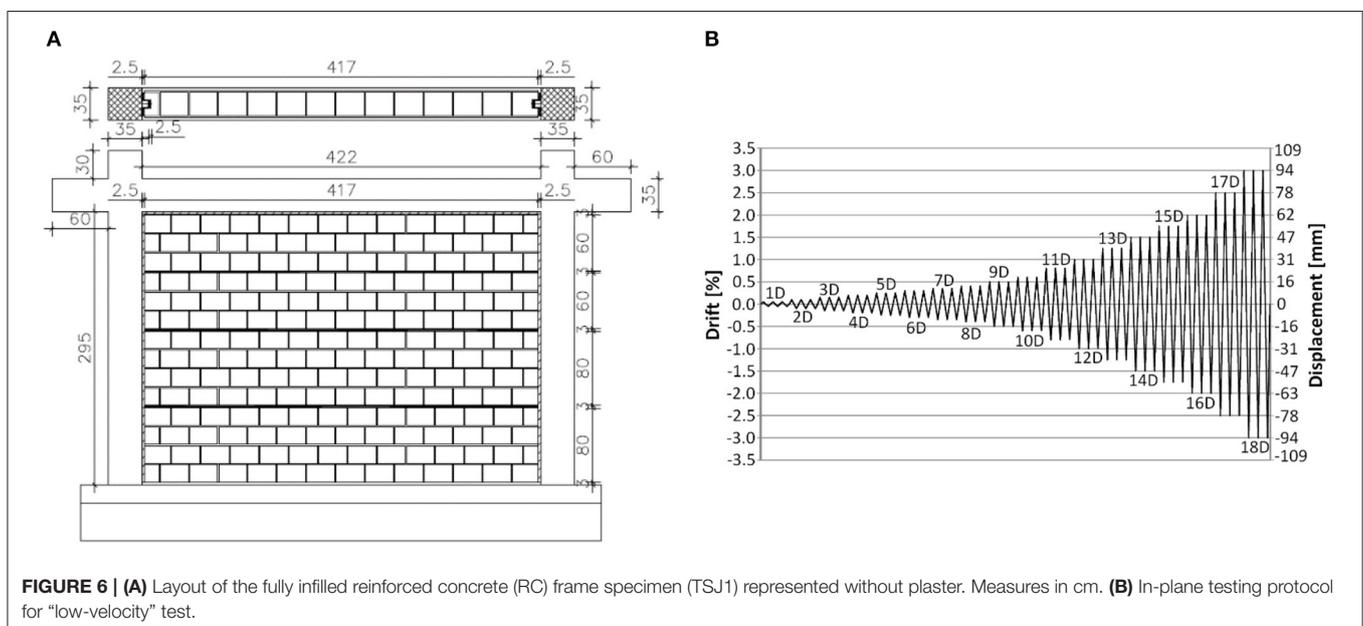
| (A) Layout of the fully infilled reinforced concrete (RC) frame specimen (TSJ1) represented without plaster. Measures in cm. (B) In-plane testing protocol for “low-velocity” test.
